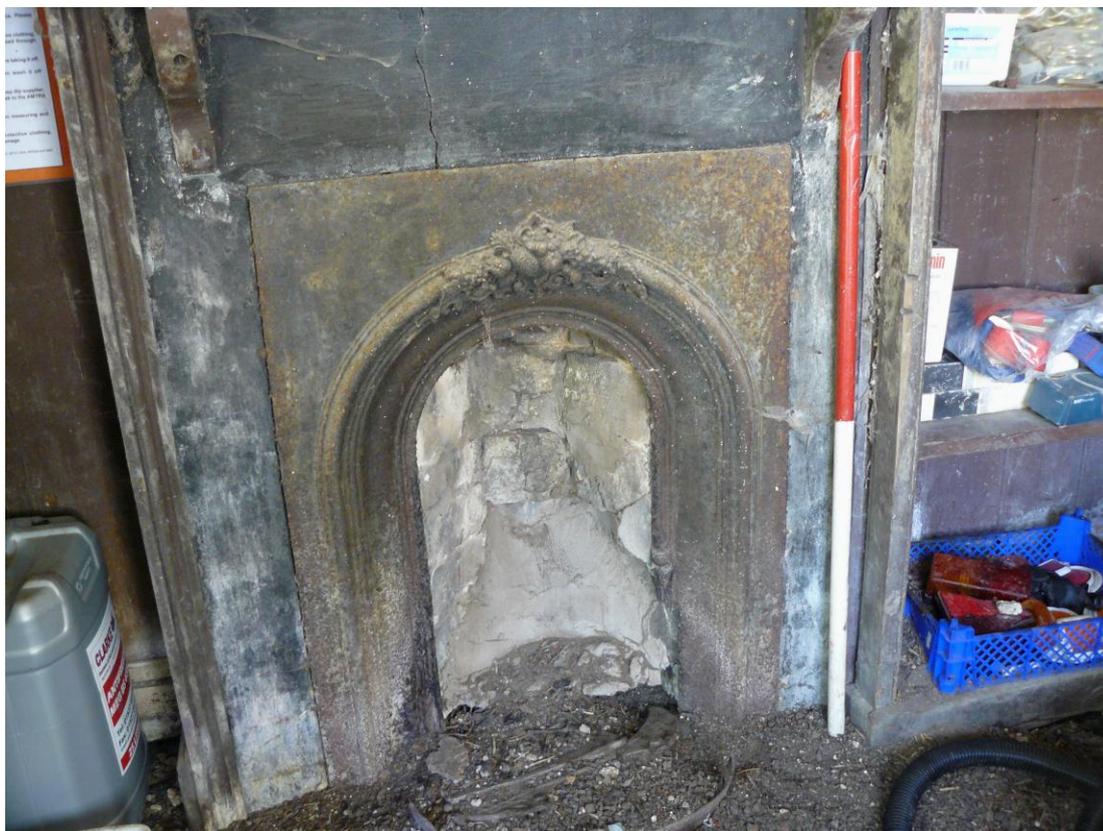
Internal view looking E showing detail of cast-iron fireplace in W-facing wall of panelled office at the S end of Building 3 (Stable Block)
